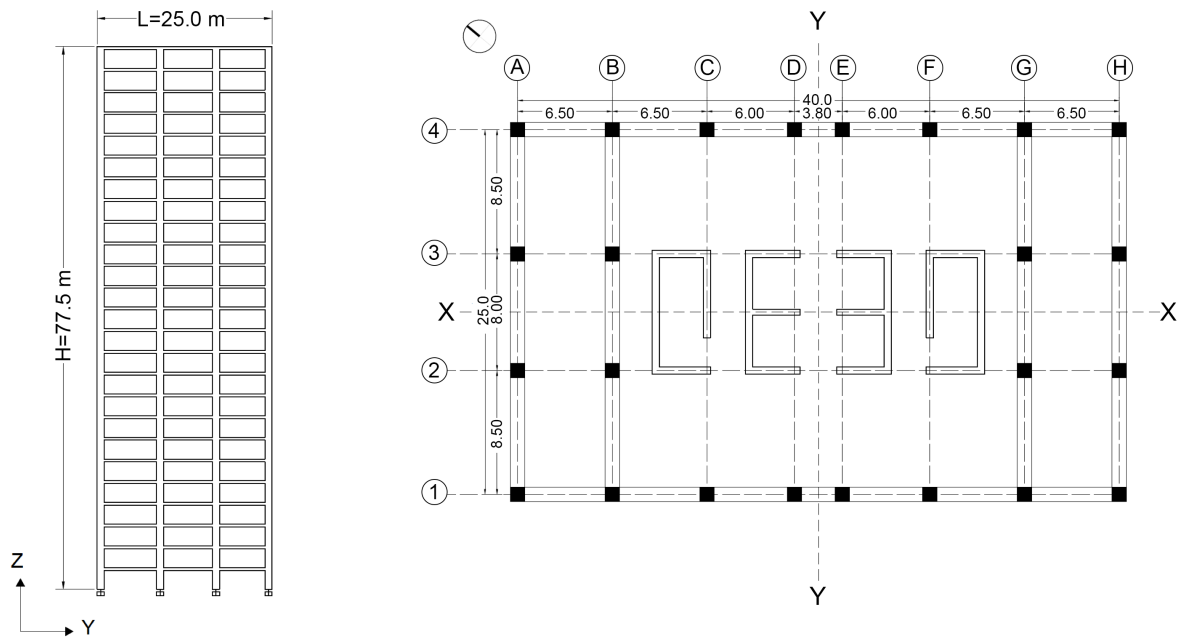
Diagram of the mid-rise building frame in the YZ plane with a typical floor plan
